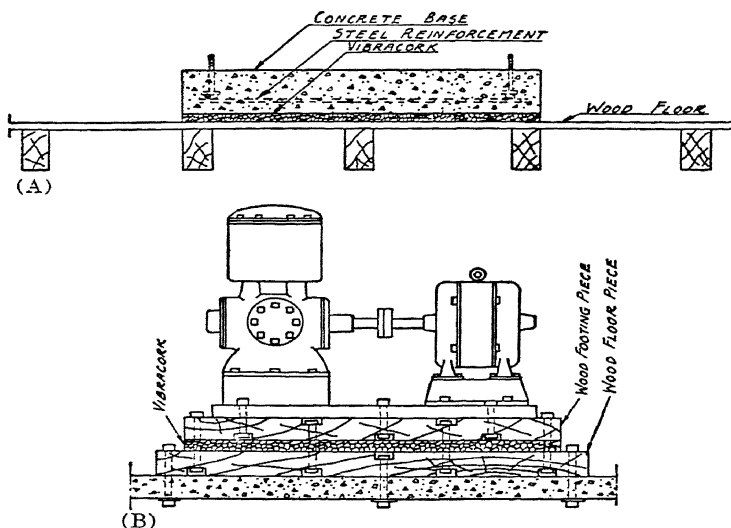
Sections Showing Application of Vibration Insulation. (A) A Floating Foundation on Mill Type Floor; (B) Pump and Motor on Same Bed Plate
